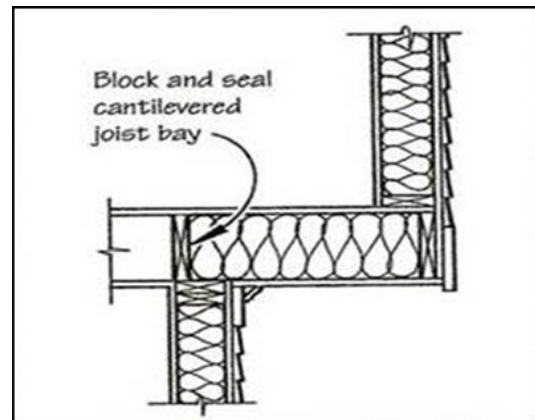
Filled, blocked, and sealed cantilevered floor (Legg, 1997, p.165)
